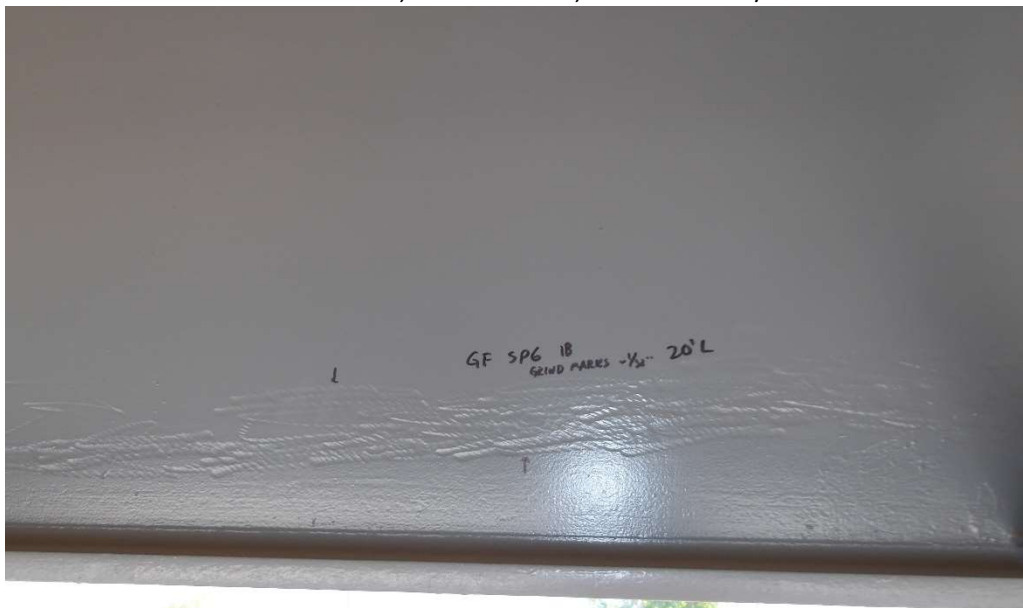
Girder F, Span 6, Grind Marks 20' L x 1/32" D
